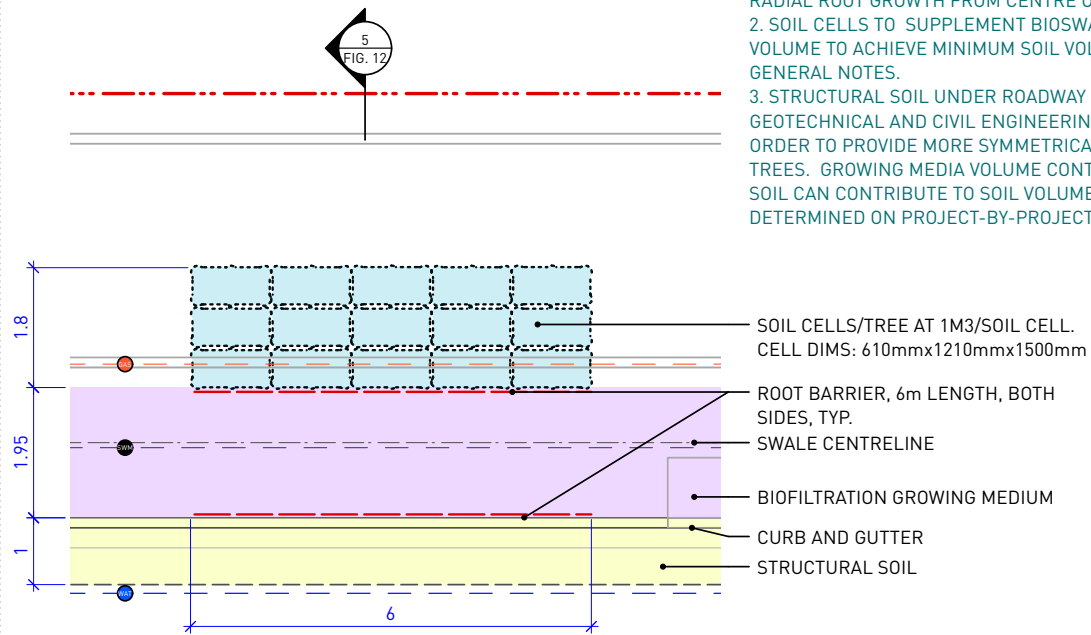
ENLARGEMENT 5 - GROWING MEDIUM NORTH - PLAN
